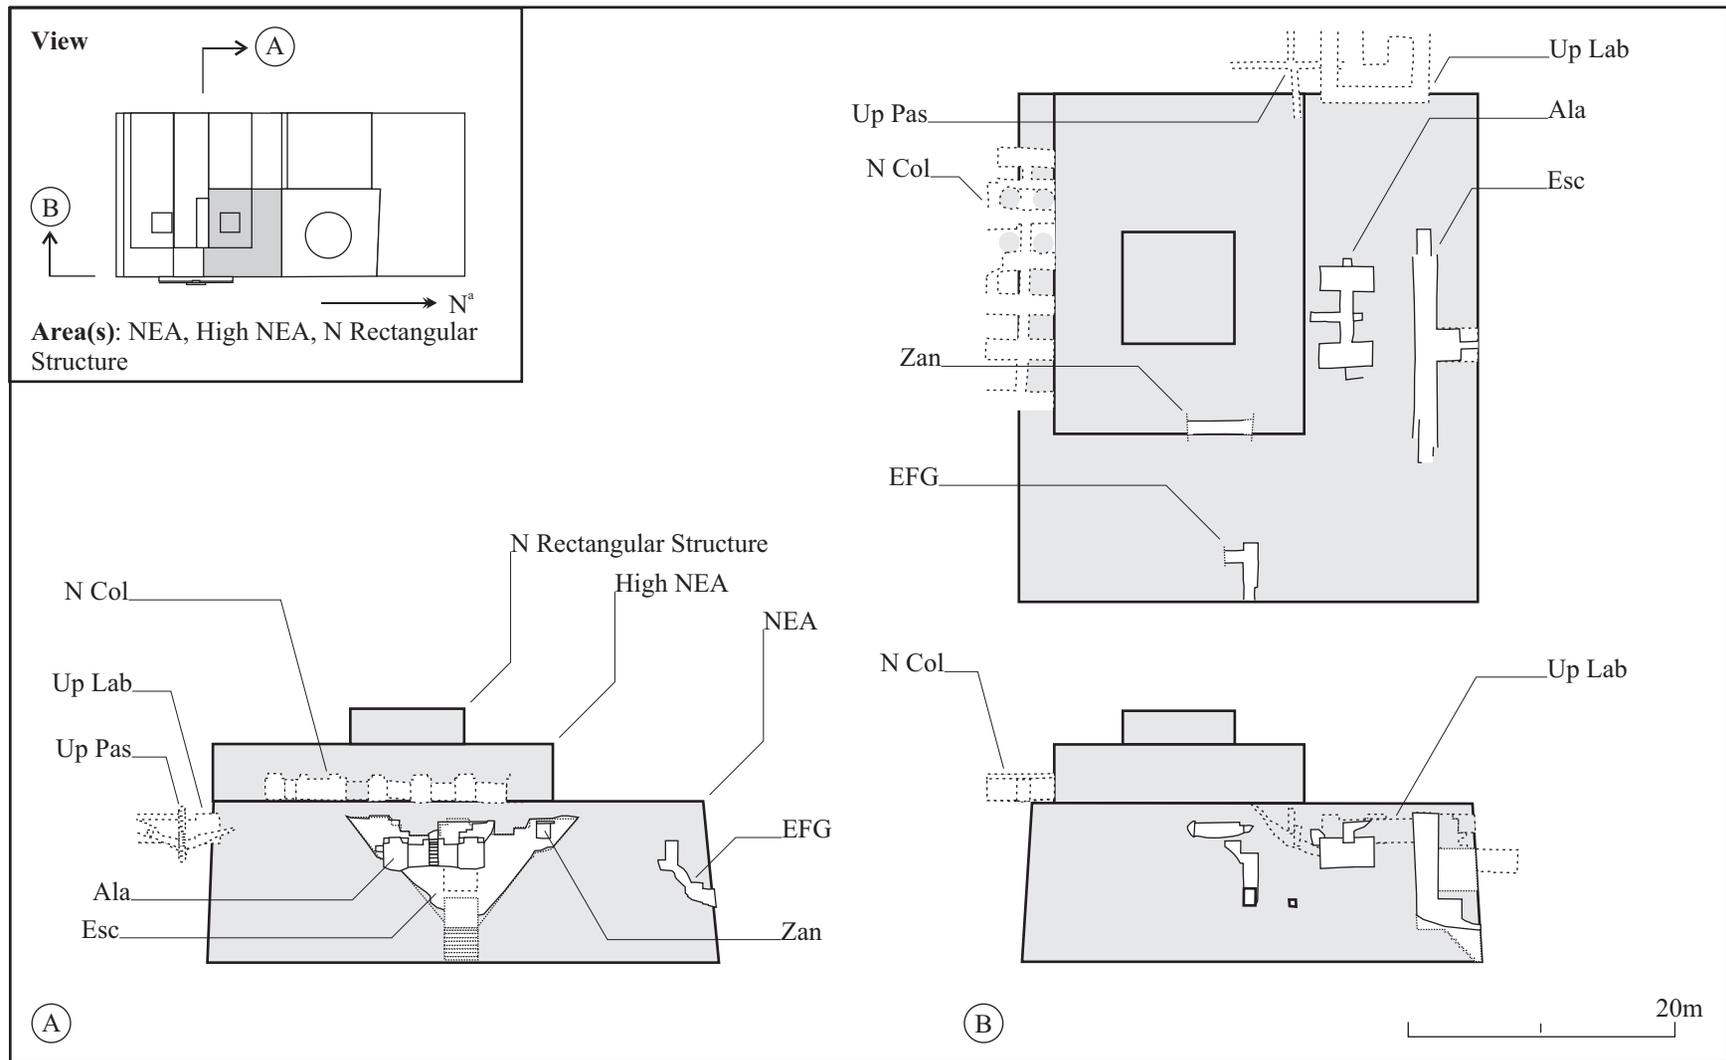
NEA (Northeast corner of Building A) area and galleries.
